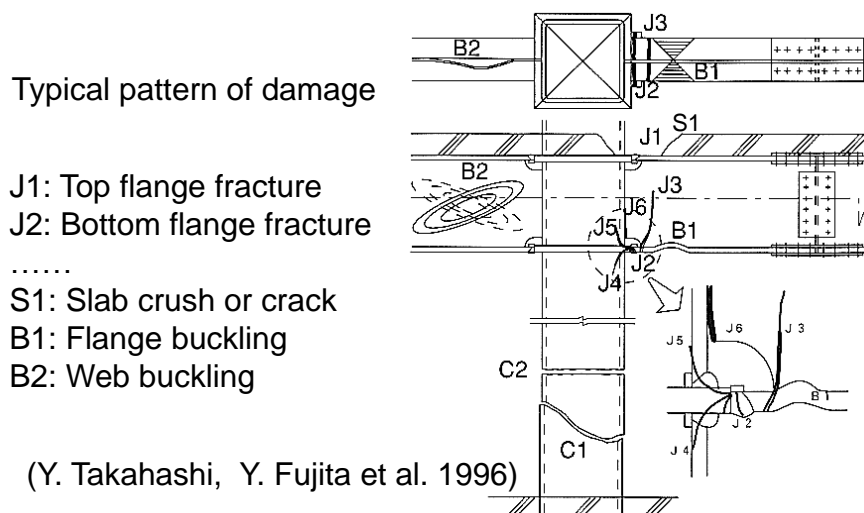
Typical damage pattern for the beam-to-column connection in the earthquake (Takahashi et al. 1996)
